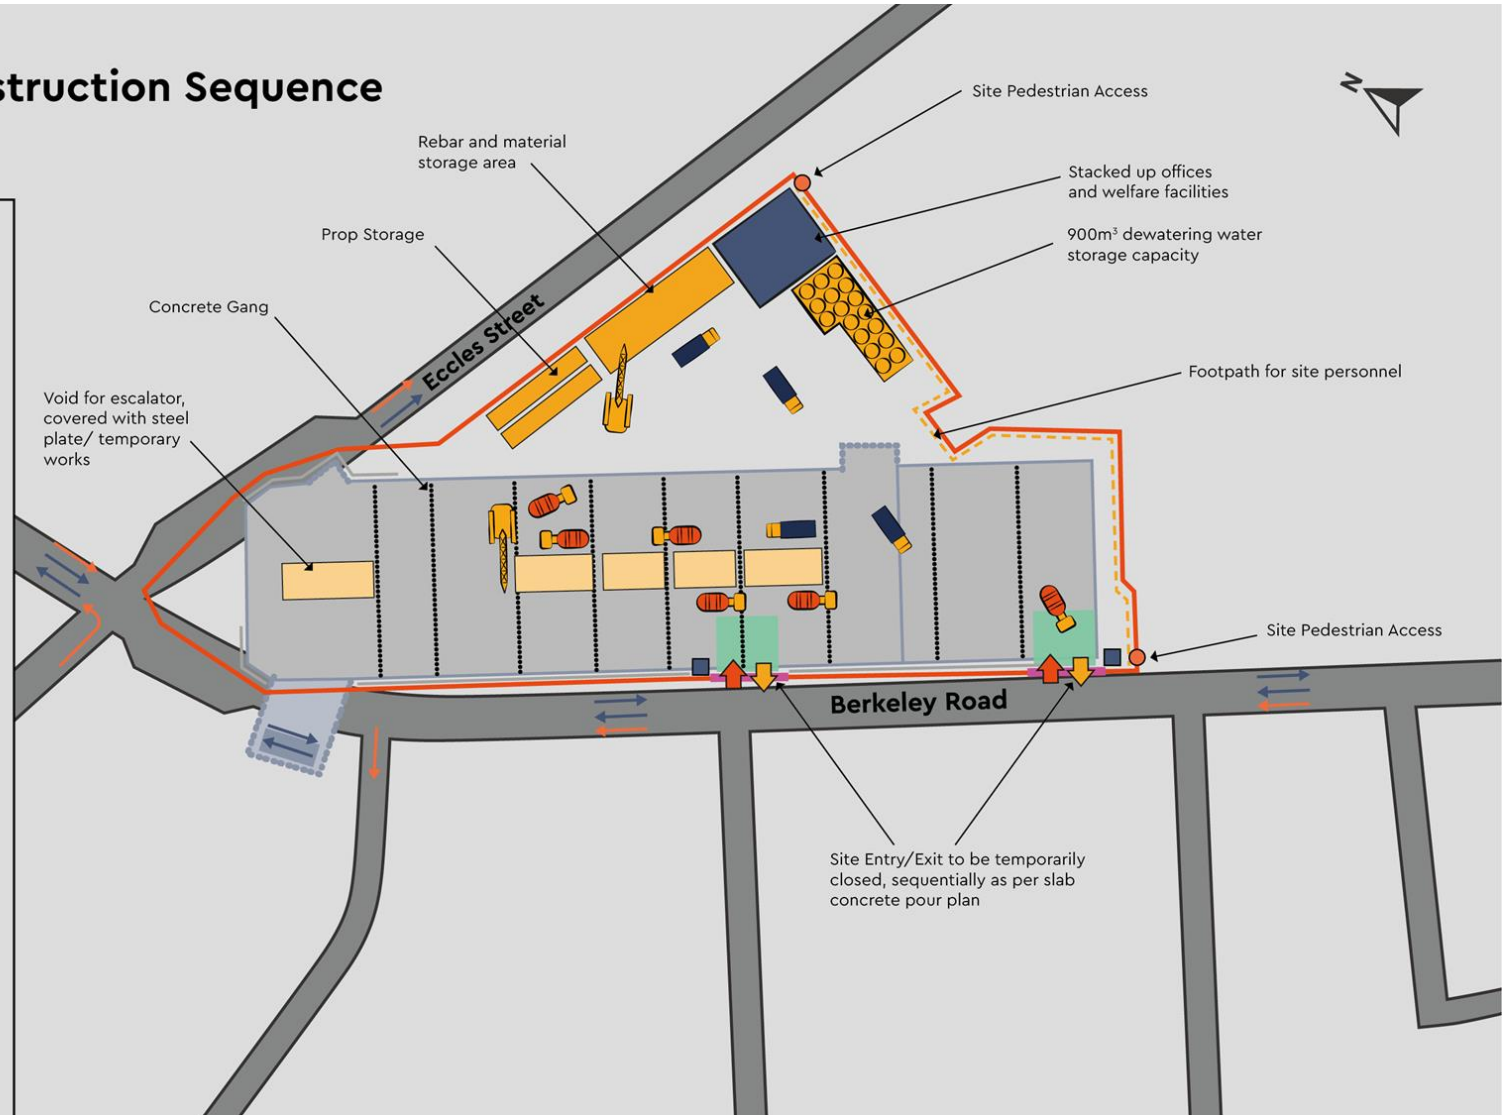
Mater Station Stage 5 – Roof slab Construction
